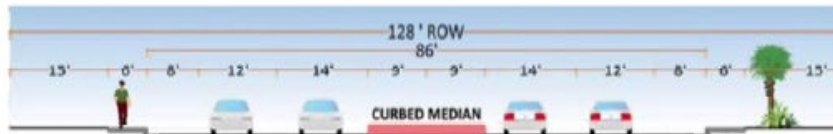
CITY OF JURUPA VALLEY GENERAL PLAN ROADWAY CROSS-SECTIONS
